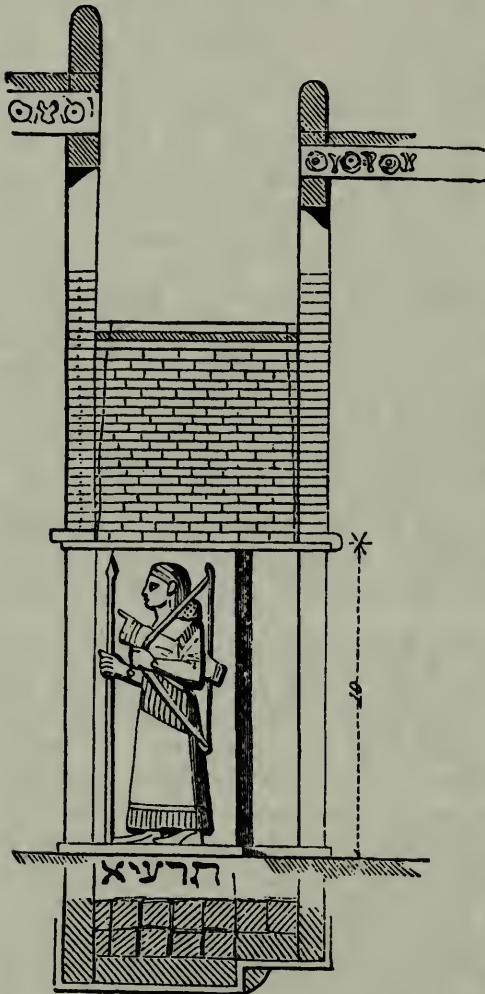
SECTION SHOWING CONSTRUCTION OF WALL AND CEILING.
